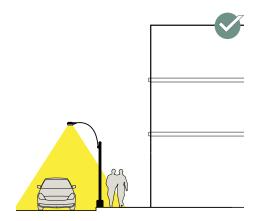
Design street lighting to minimize light spill onto adjacent properties and the sky.
